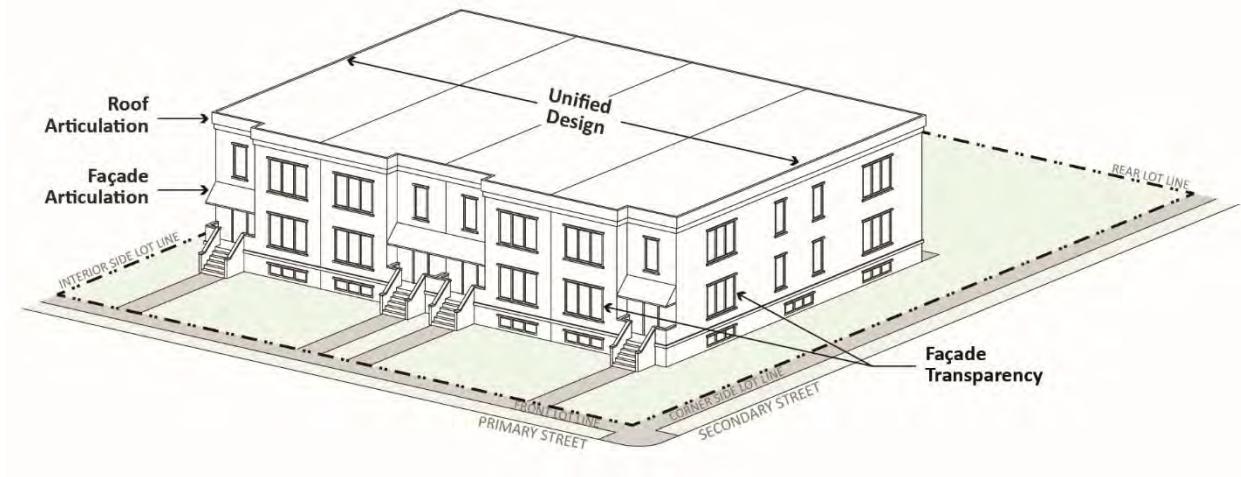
Multiple-Unit Dwelling and Townhouse Dwelling Unit Design Requirements
